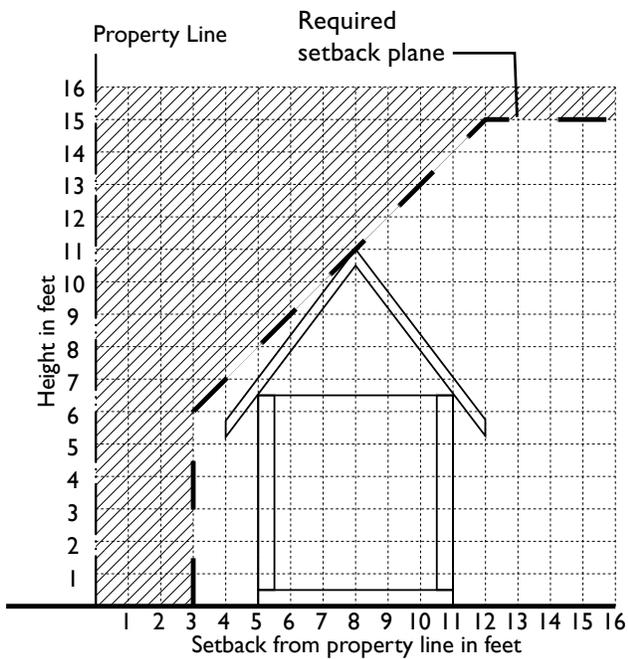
Illustrative example of Major Accessory Structures with high-pitched roof.
